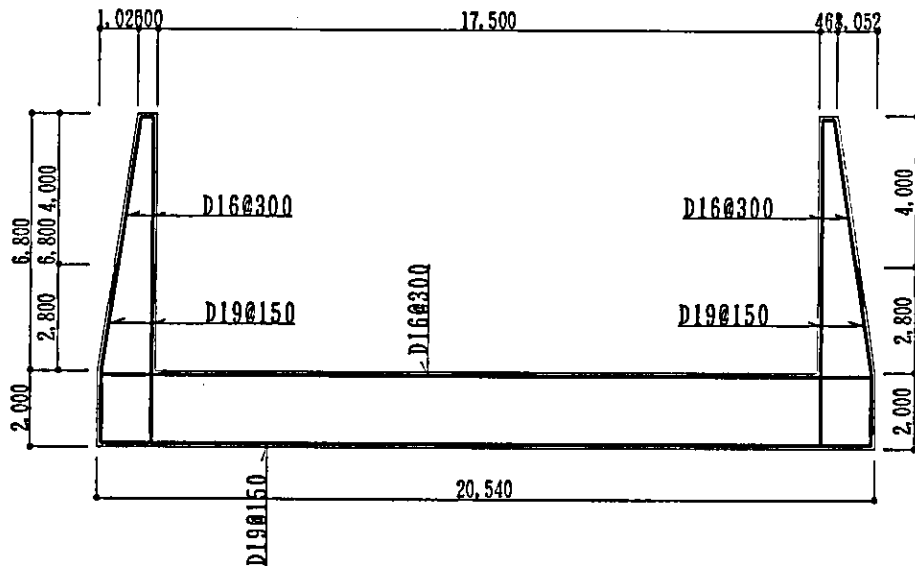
REINFORCEMENT BAR ARRANGEMENT
